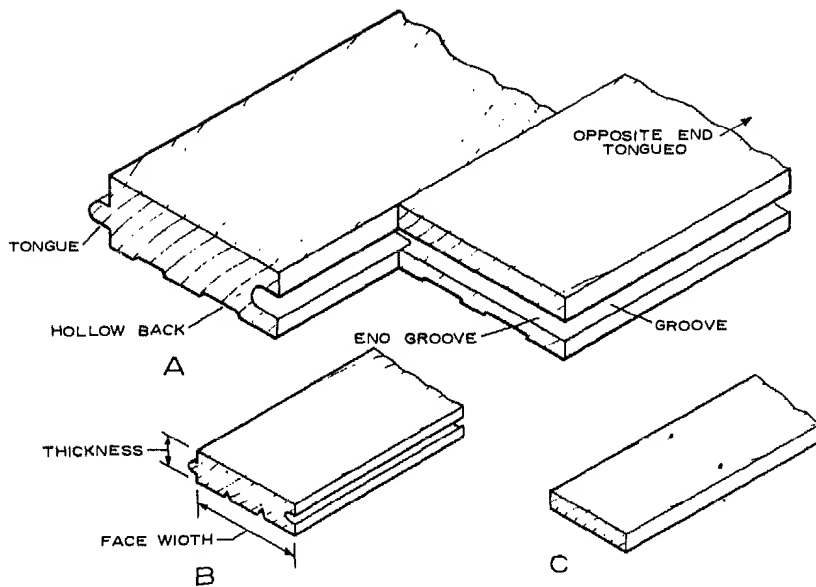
Types of strip flooring: A, side- and end-matched —  $\frac{25}{32}$ -in; B, thin flooring strips — matched; C, thin flooring strips — square-edged.
